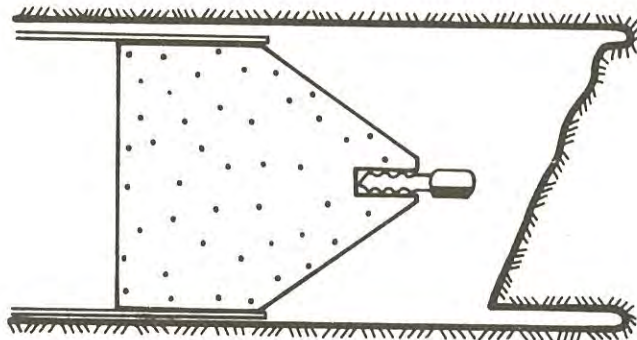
Orienting device for 4 inch diameter horizontal drill holes.
